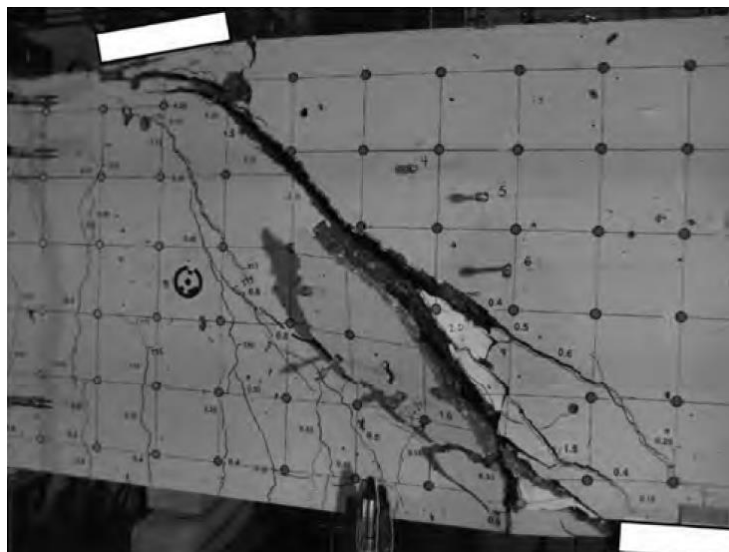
Example of Failure of Compression Strut in a reinforced concrete beam [13]
